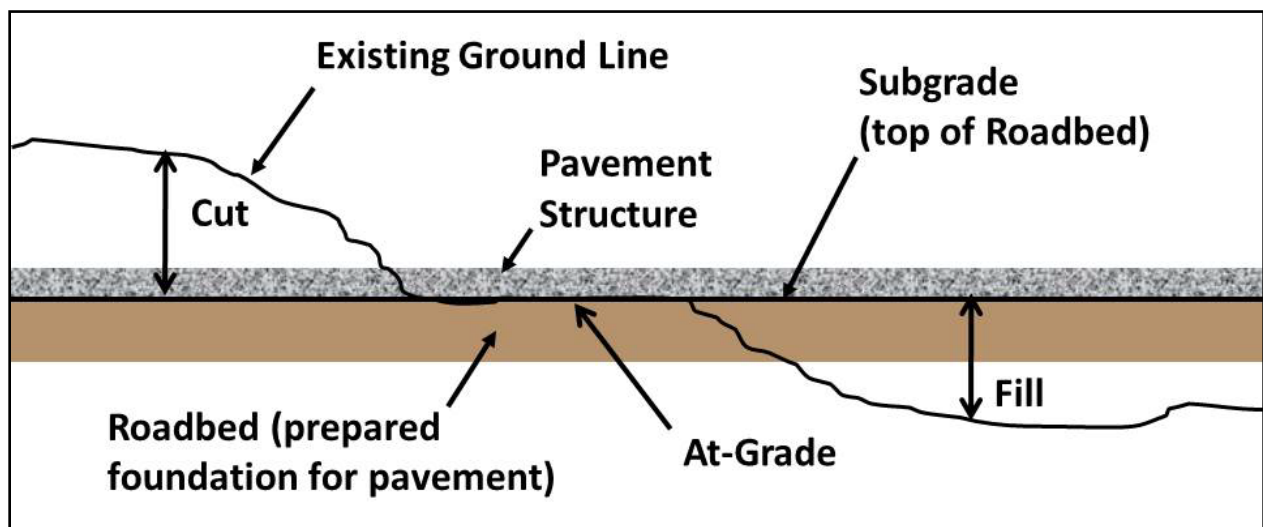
Illustration of pavement and subgrade through cut, at-grade, and fill conditions.
